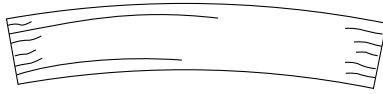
Appearance of cracks in a typical specimen after failure.
